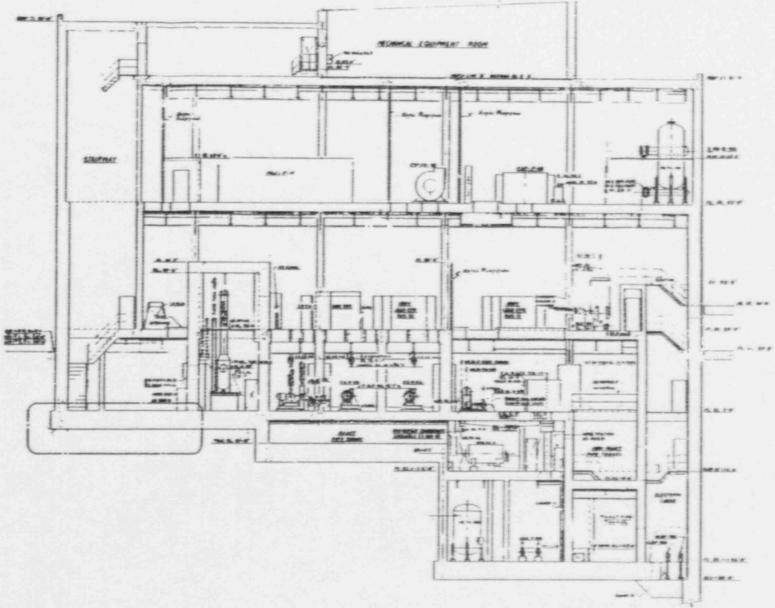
Seabrook 1 Primary Auxiliary Building Section 2, Looking West
